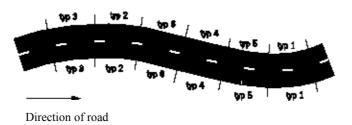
Principle of test section arrangement. The figure shows how the placing of the six test markings along the road was decided by drawing lots.
